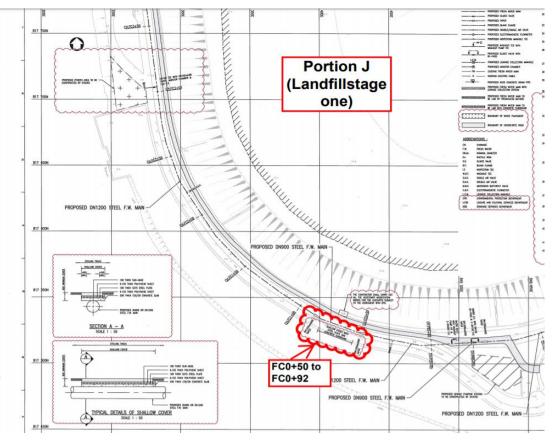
Location Plan – Landfill Stage 1 (Area FC0+50 -FC0+92)
